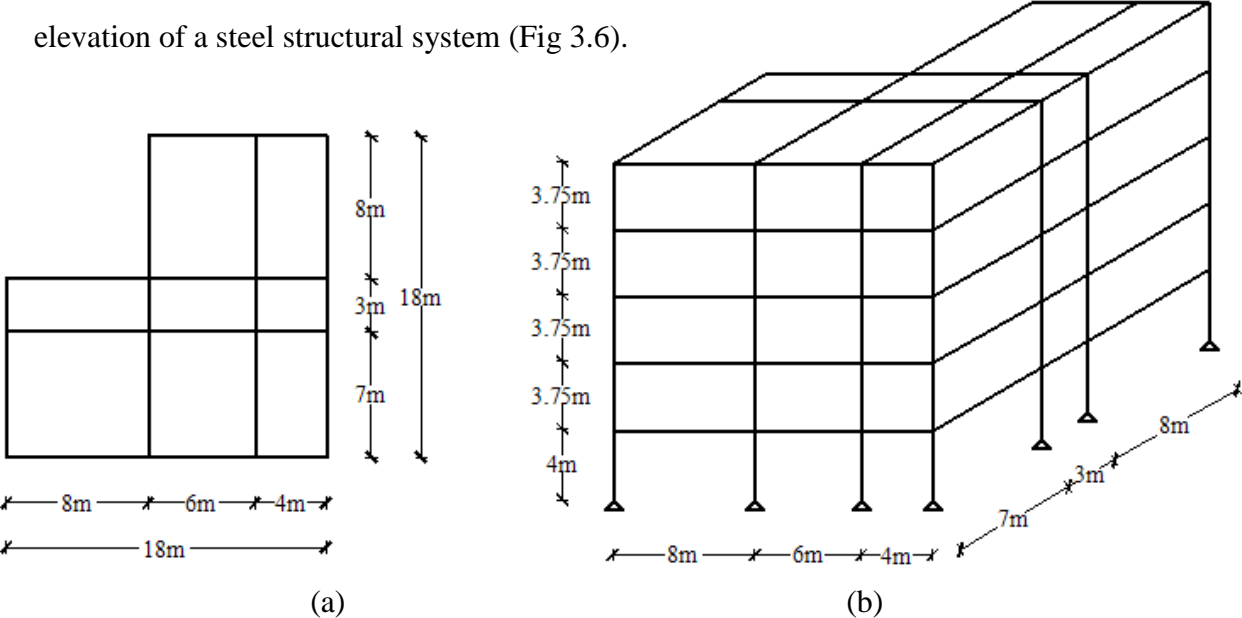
Third type of frame model (a) Asymmetrical plan, (b) Symmetrical elevation.
